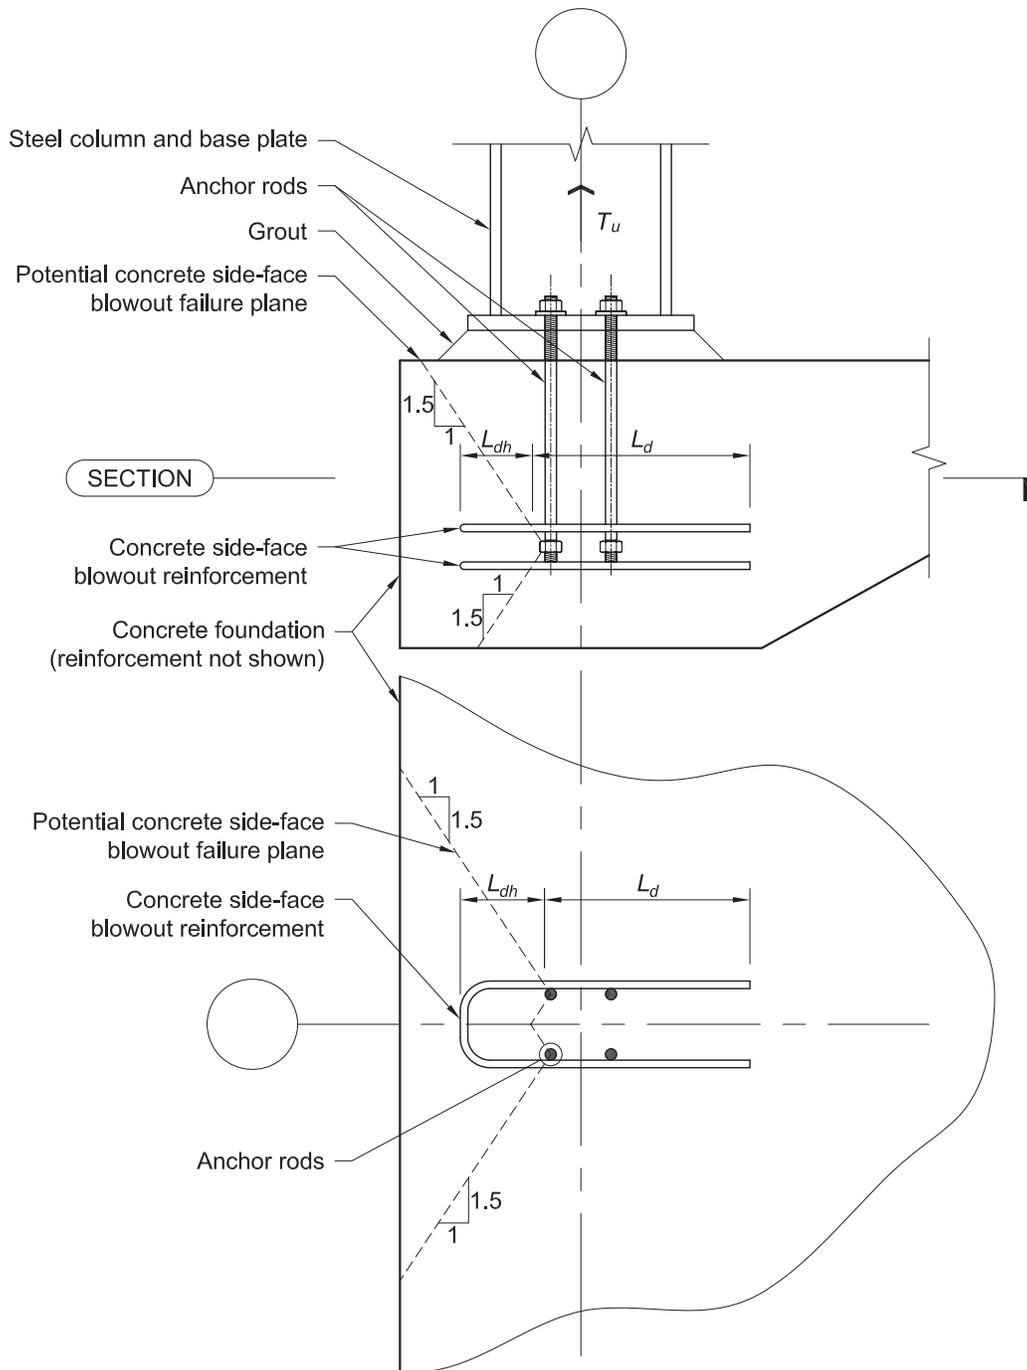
The use of steel reinforcement for restraining concrete side-face blowout.
